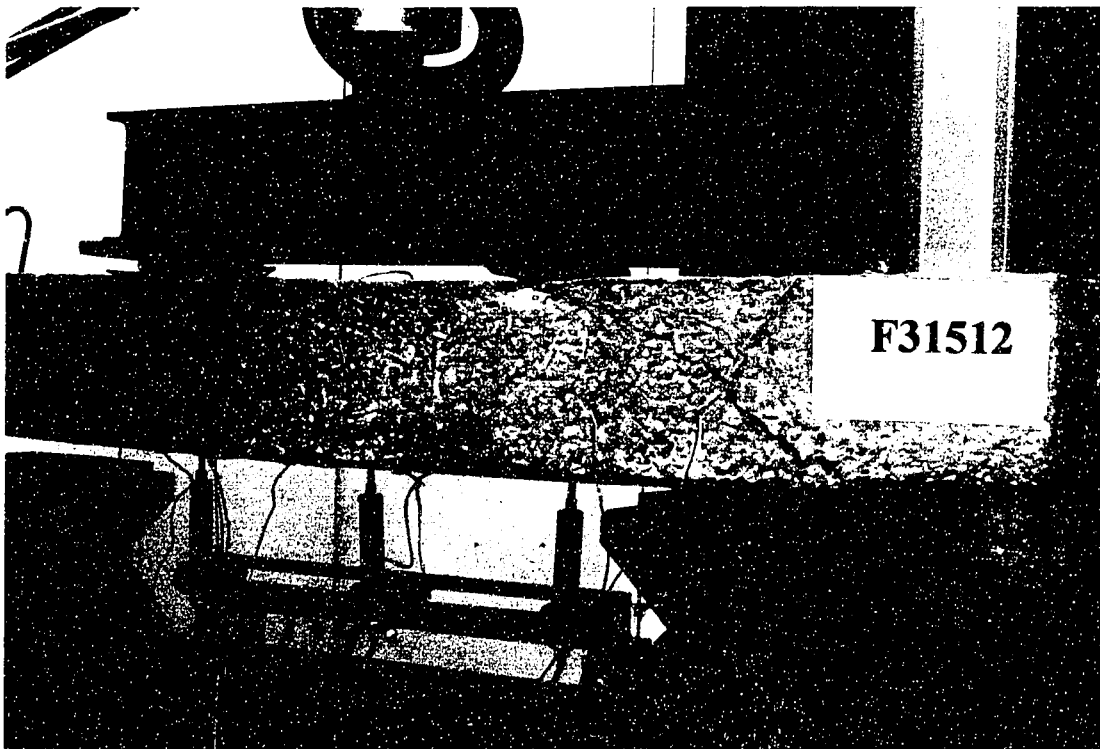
Photograph showing the mode of failure for beam F31512 strengthened by 3 mm thick, 100 mm wide and 900 mm long plate with 120 mm c/c spacing of stirrups
